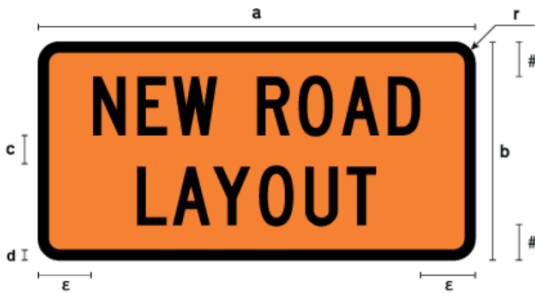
W2.-1.11B sign new road layout supplementary for backing board
